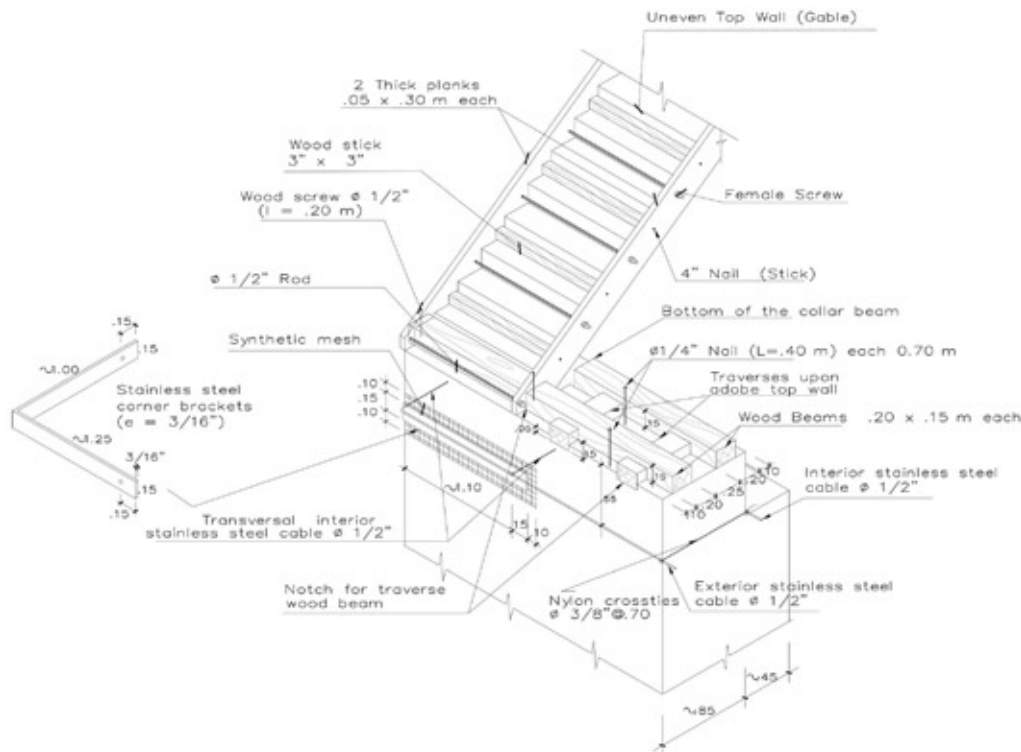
Design of a minimal intervention reinforcement for the Church of Rapaz (detail of upper corner).
